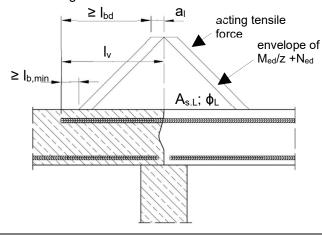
Overlapping joint for rebar connections of slabs and beams
